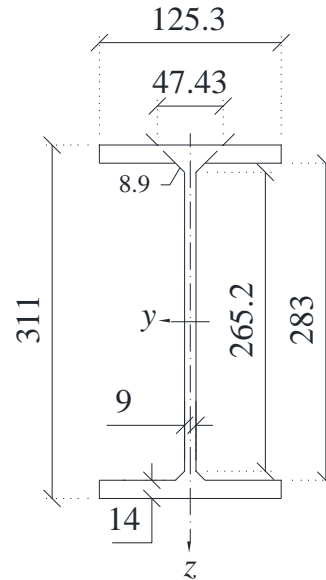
Cross-sectional dimensions of I-beam (mm)
